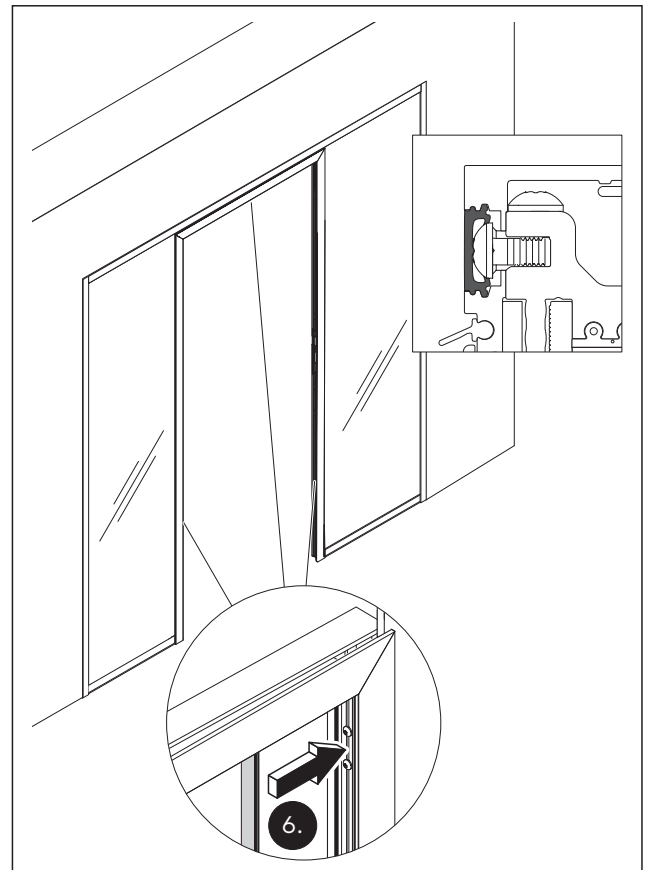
Attach the inner silicone seals over the screws in the passage.
